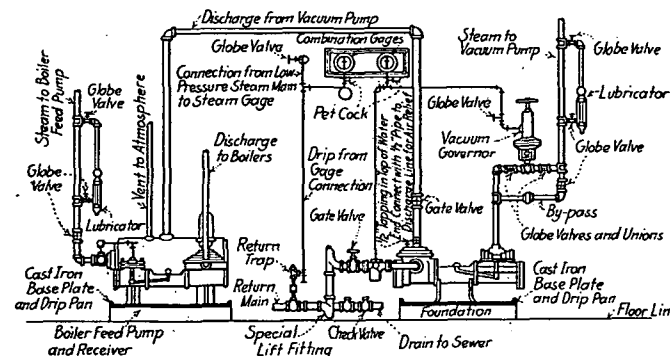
METHOD OF CONNECTING VACUUM PUMP AND AUTOMATIC BOILER-FEED PUMP AND RECEIVER
